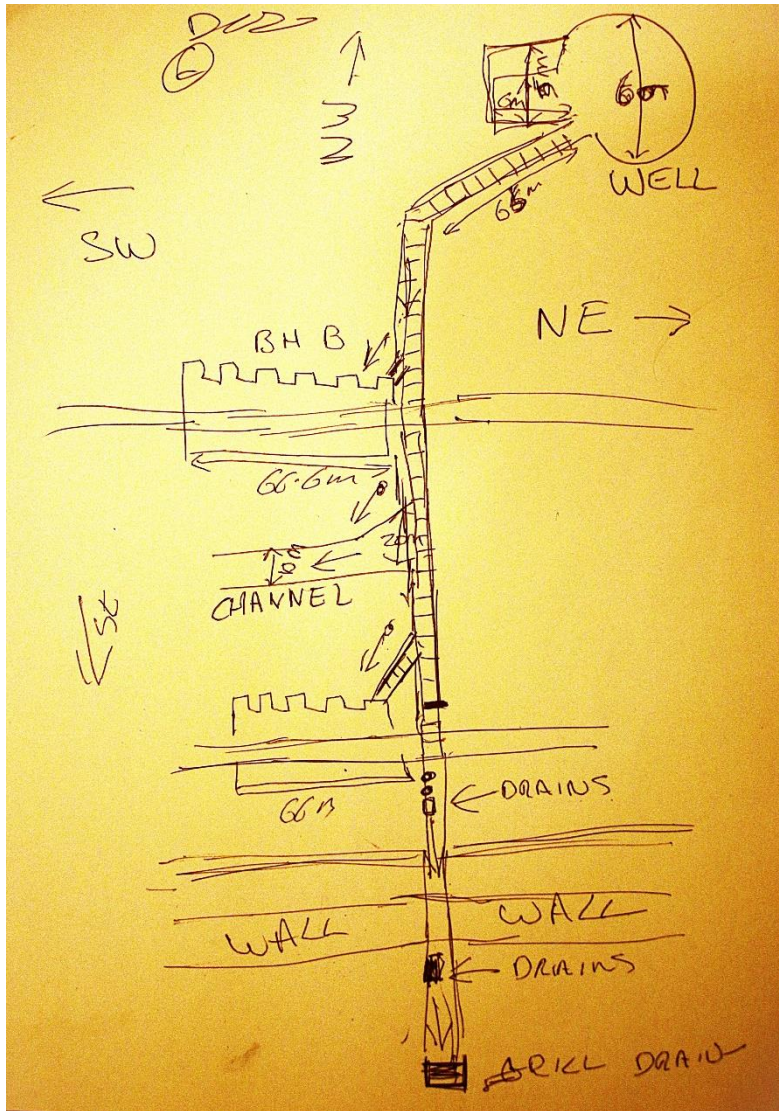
Hand-drawn field sketch illustrating the spring-fed well, primary culvert run, associated drainage features, road crossings, bathhouse connections, and the engineered exercise/swimming channel. The sketch is orientated with cardinal directions indicated and is not to scale.
